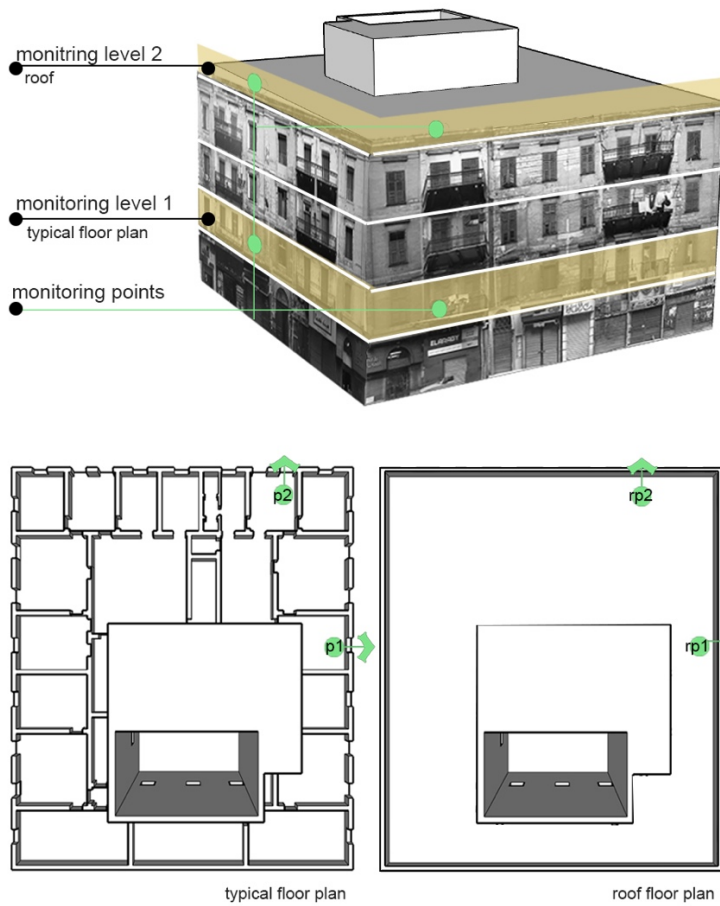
(above) case study building isometric showing different monitoring levels and points, (bottom left) the location of the monitoring points in the first-floor plan, and (bottom right) the location of the monitoring points in the roof floor plan.
